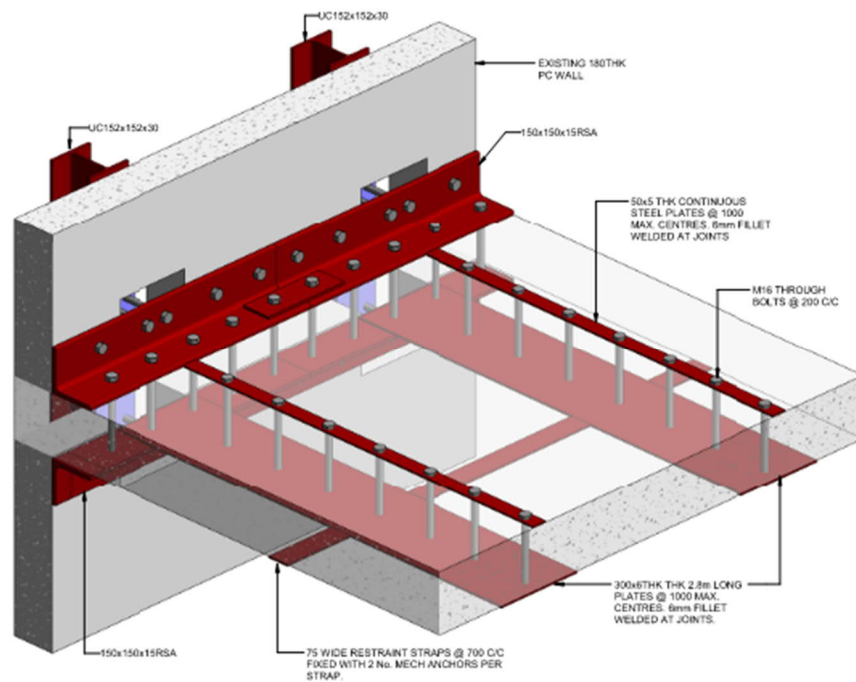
Typical flank wall strengthening detail with external columns – St James House
